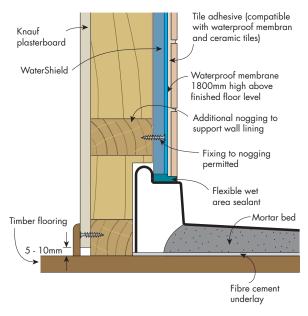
Wall Base in Shower Area Preformed external shower tray – Elevation
